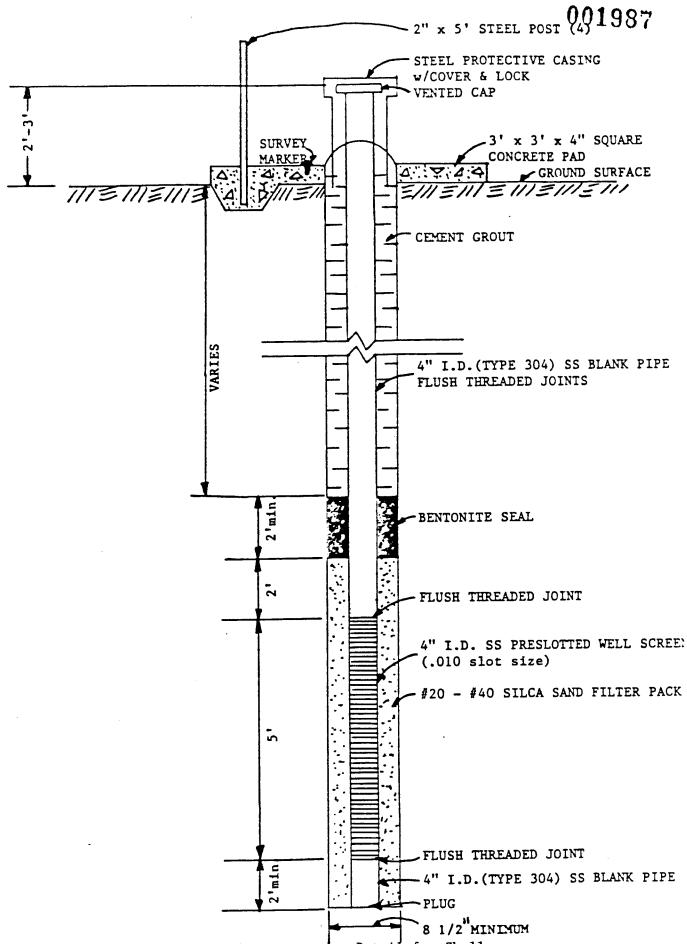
Typical Construction Detail for Shallow Monitoring Well.
